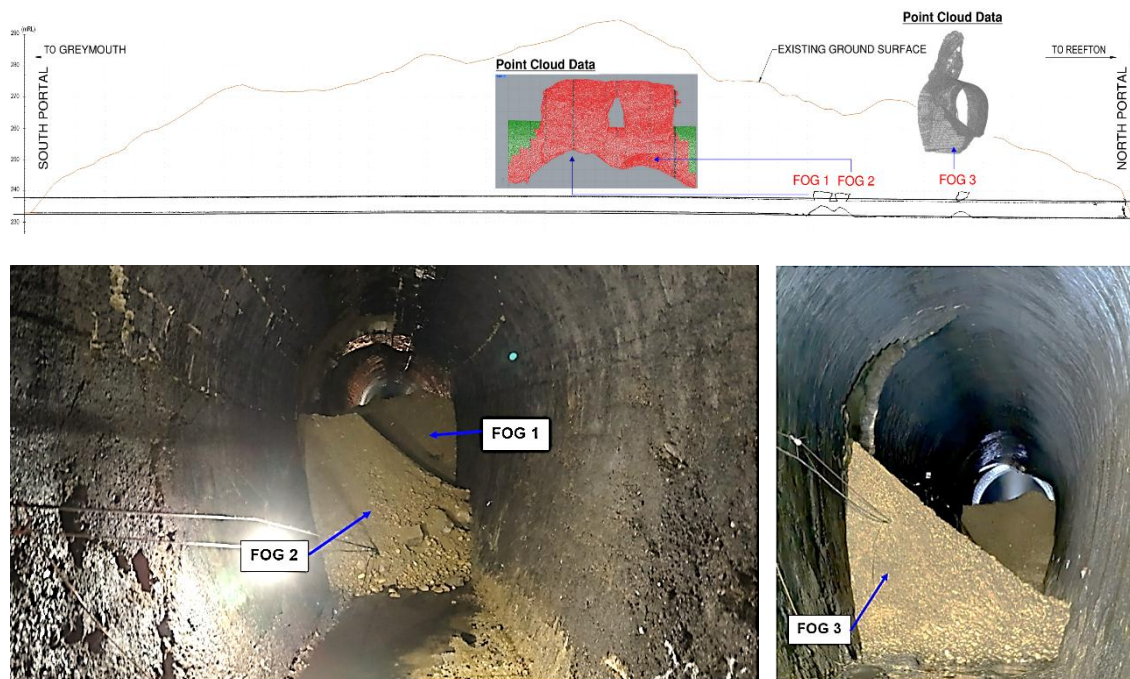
Tunnel long section and fogs of SNL tunnel 1
